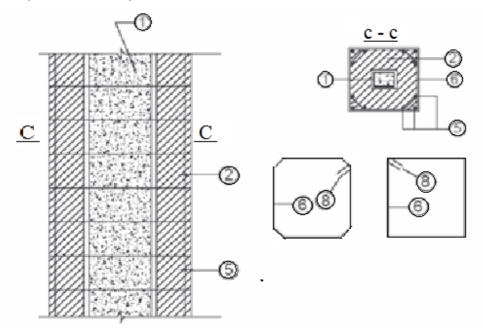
Repair of concrete column by four-sided jacketing (1. Existing column;
